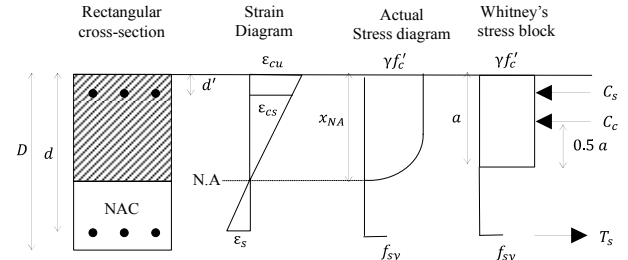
Stress and strain diagrams of doubly reinforced concrete (NAC) beam with rectangular cross-section
